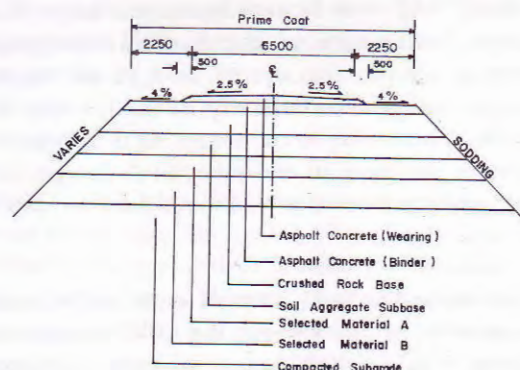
Typical Pavement Cross-Section of the Thailand Highway
